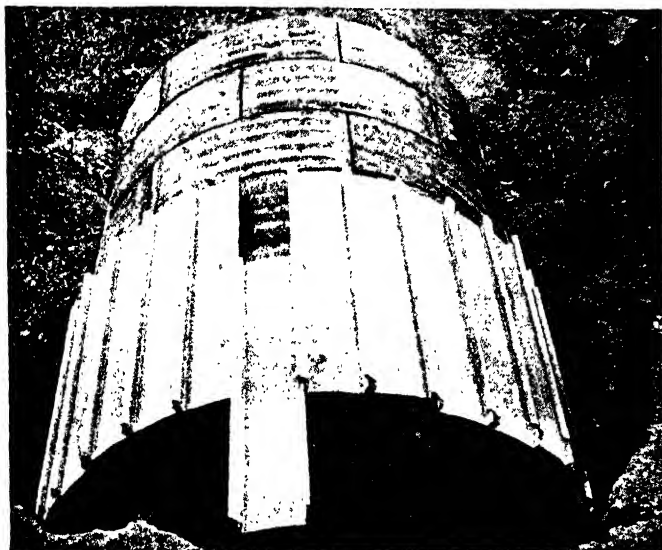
Steel poling plates for tunneling through running ground with liner-plate support. (Courtesy of Commercial Shearing & Stamping Co.)
